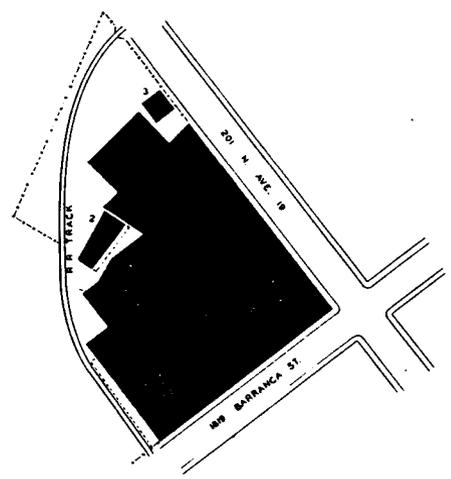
Structure Location Plan for TA-44 - Los Angeles Shop
